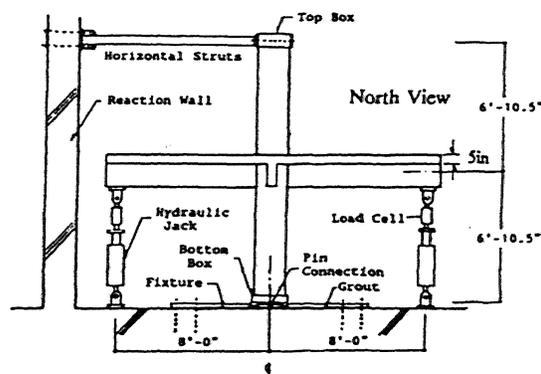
Specimen dimensions and setup (1 ft = 304.8 mm).
